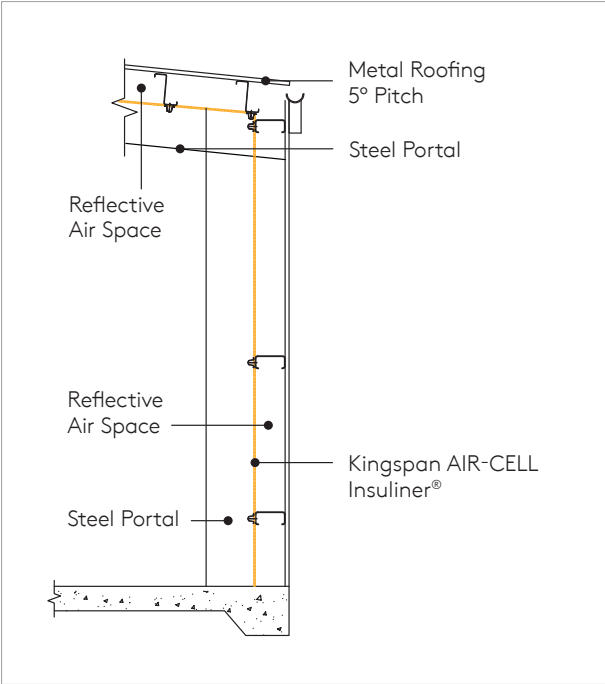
Side elevation of Kingspan AIR-CELL Insuliner® in a warehouse wall retrofit.
